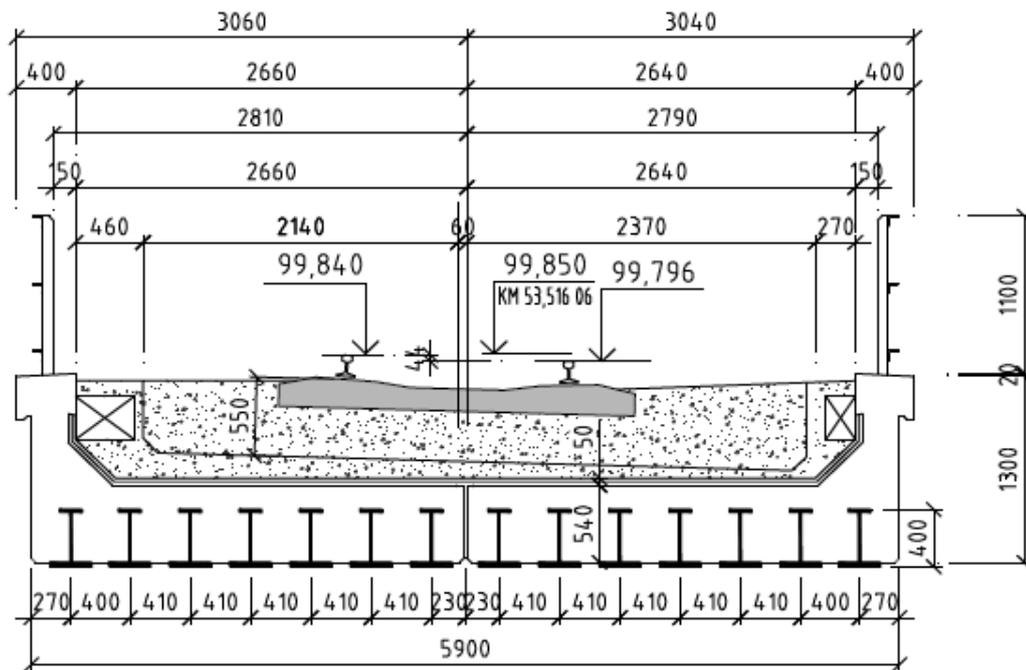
Railway bridge with 10m span from imbedded asymmetrical steel beams
